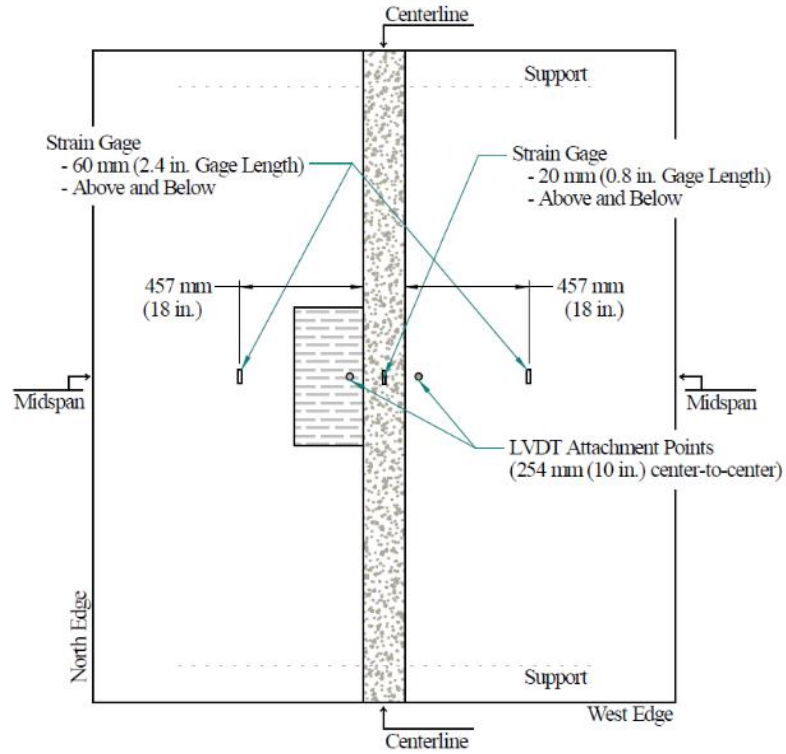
Layout for transverse joint specimen (Graybeal 2010)
